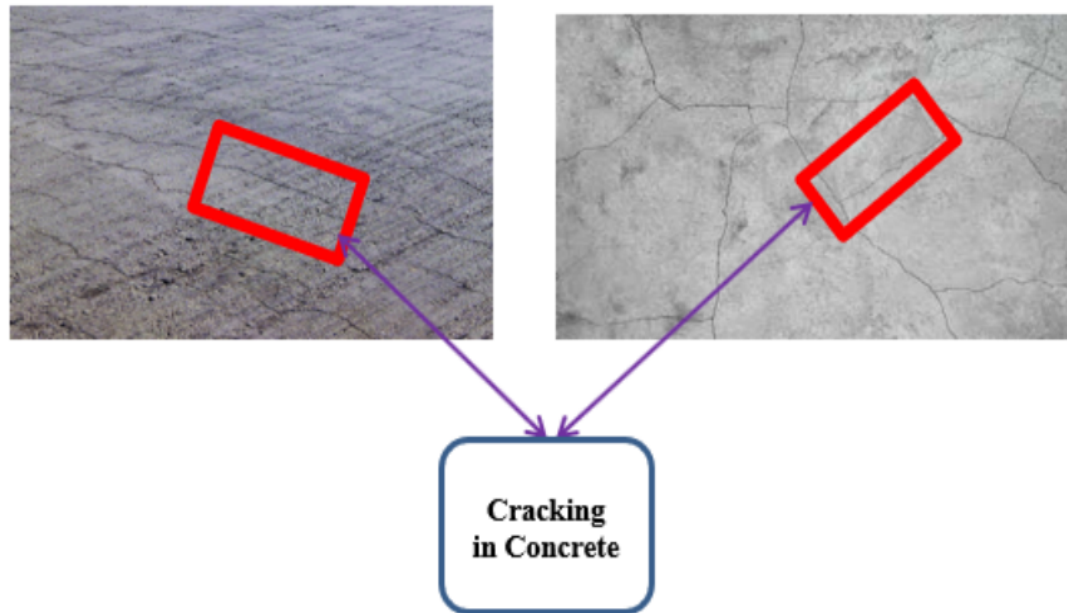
Observed Cracks in Rigid Pavement[32]
